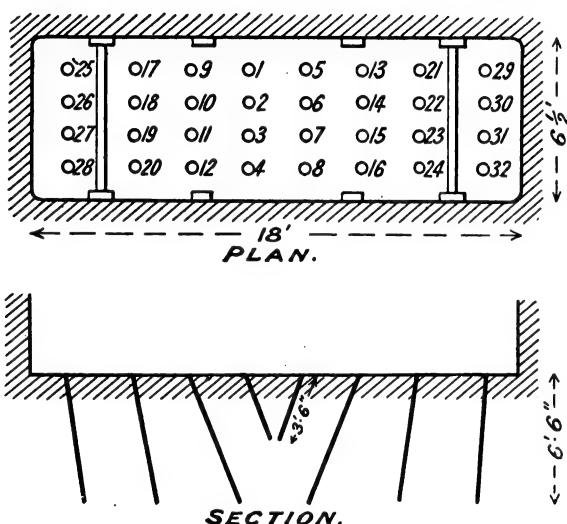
Arrangement of Shot-holes at the Bottom of a Rectangular Shaft.
